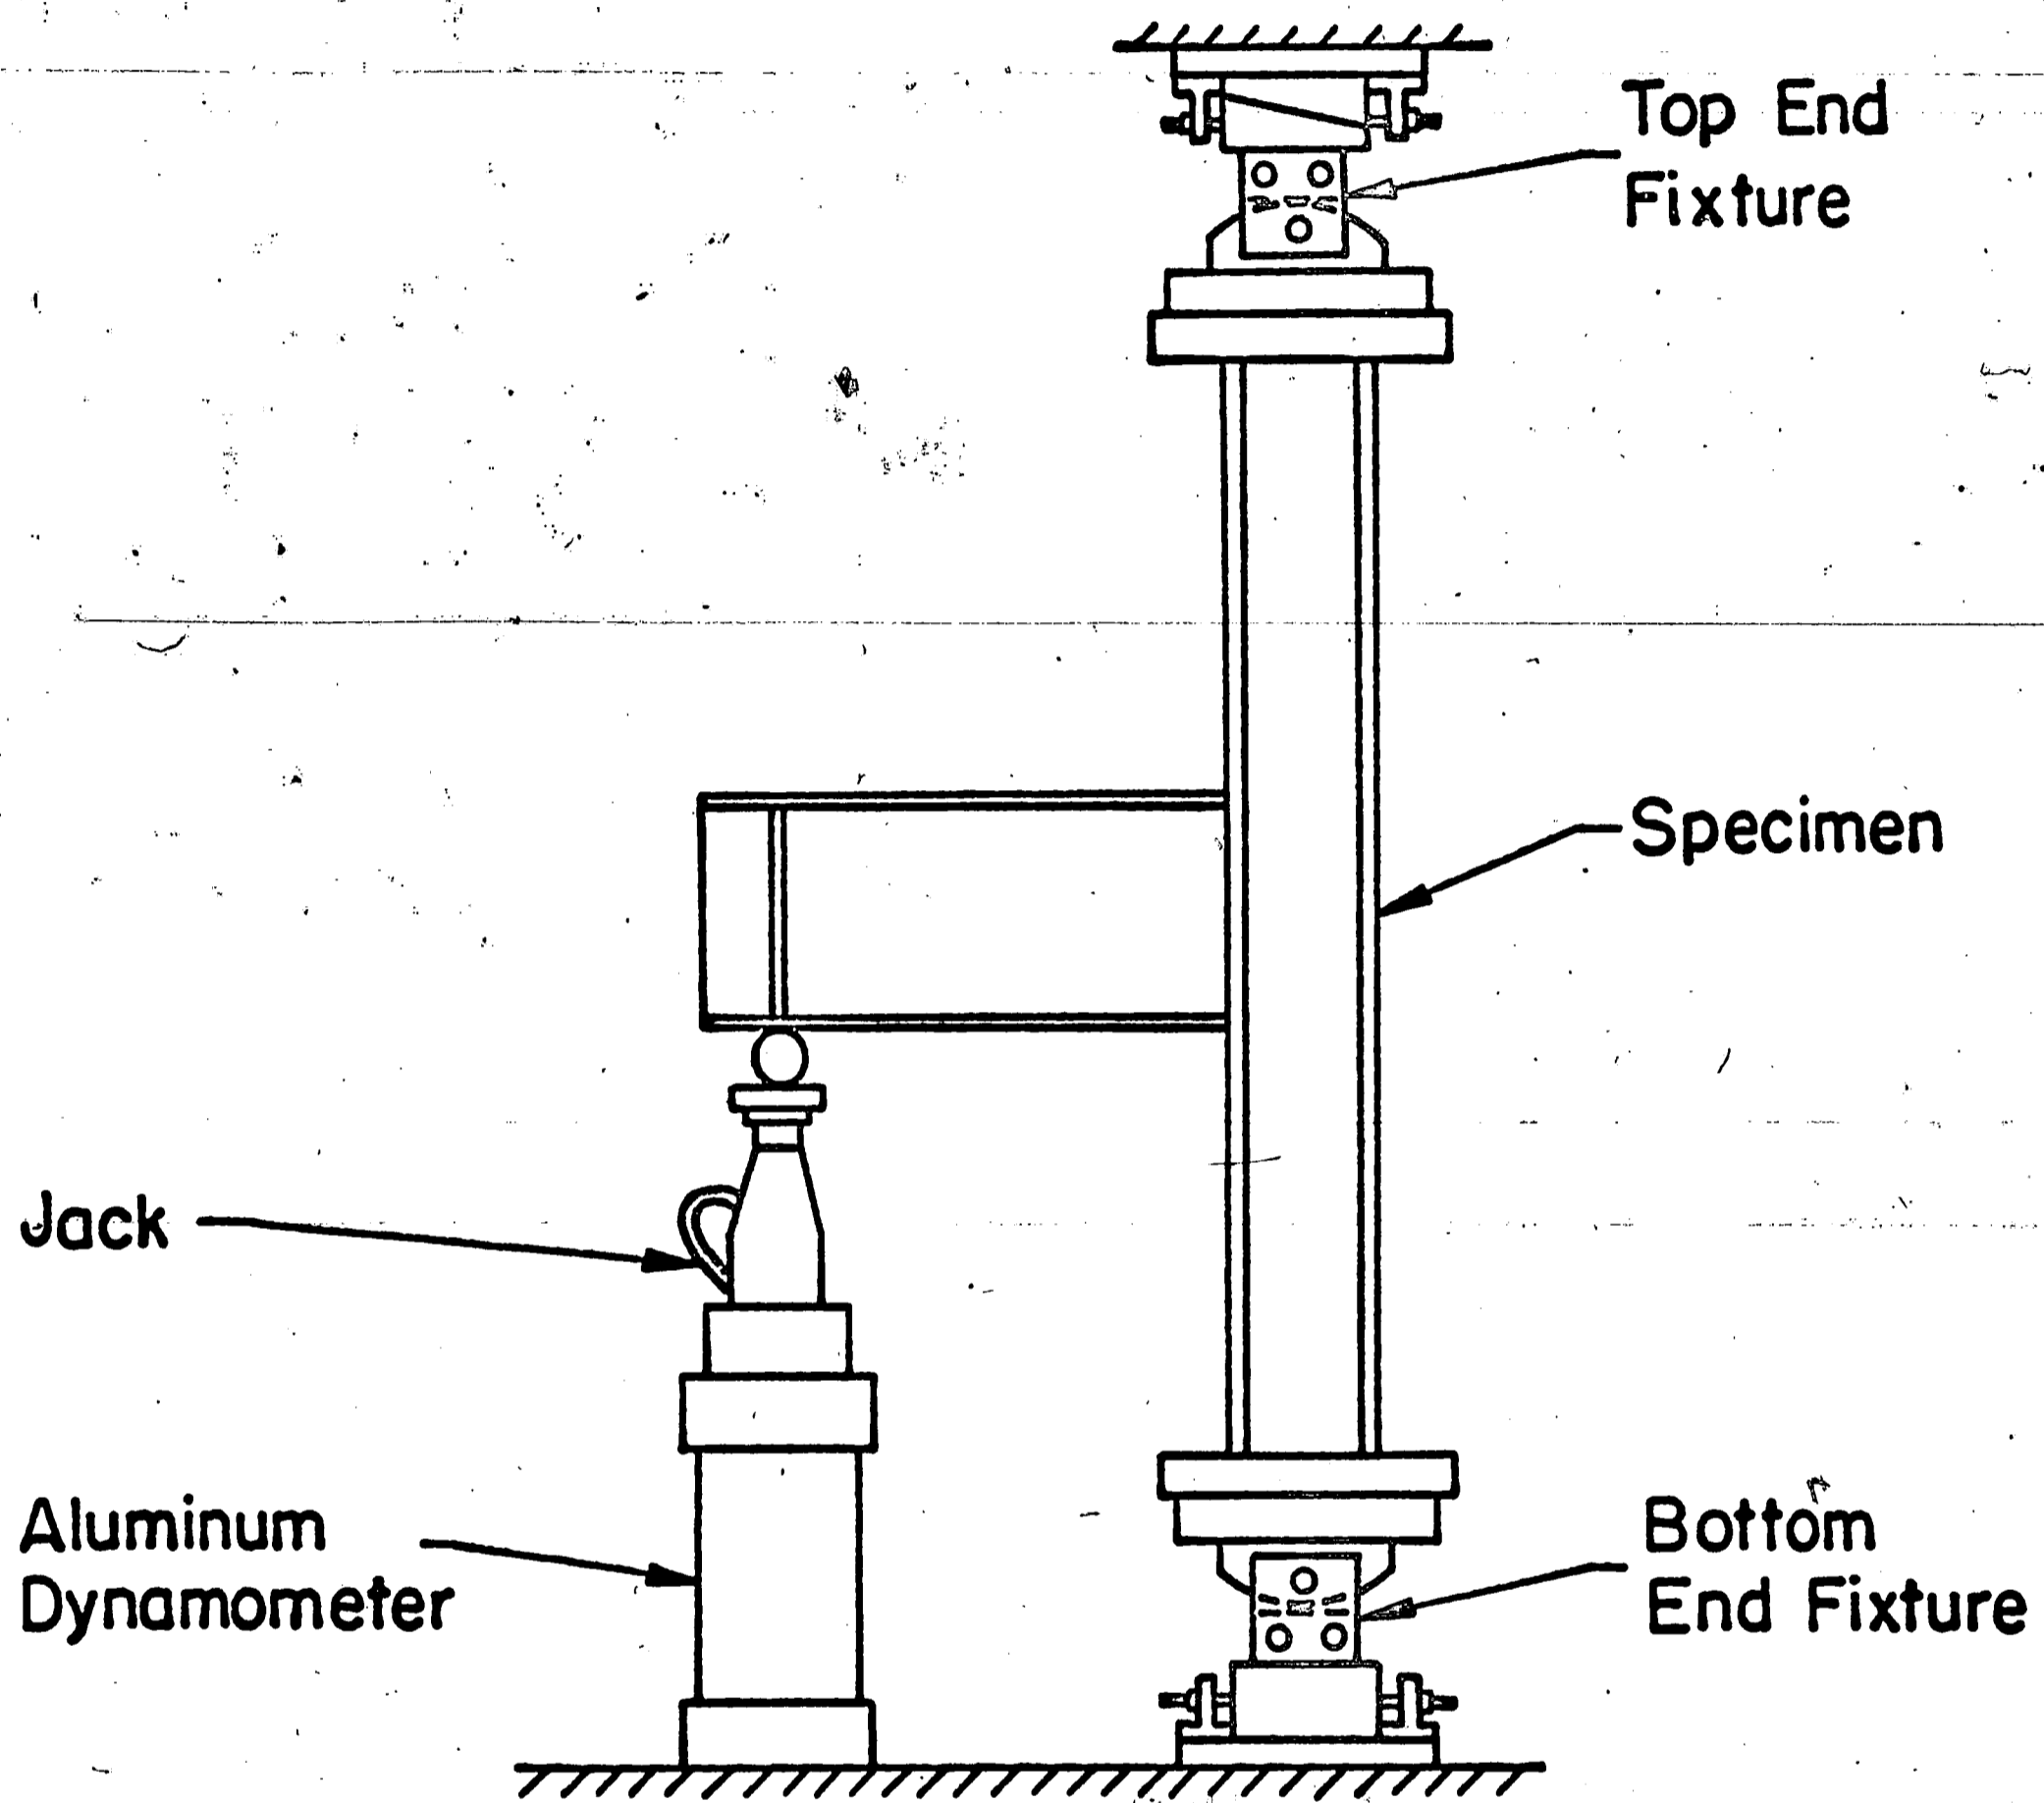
A. Test Setup with Pinned-End Column Fixtures
